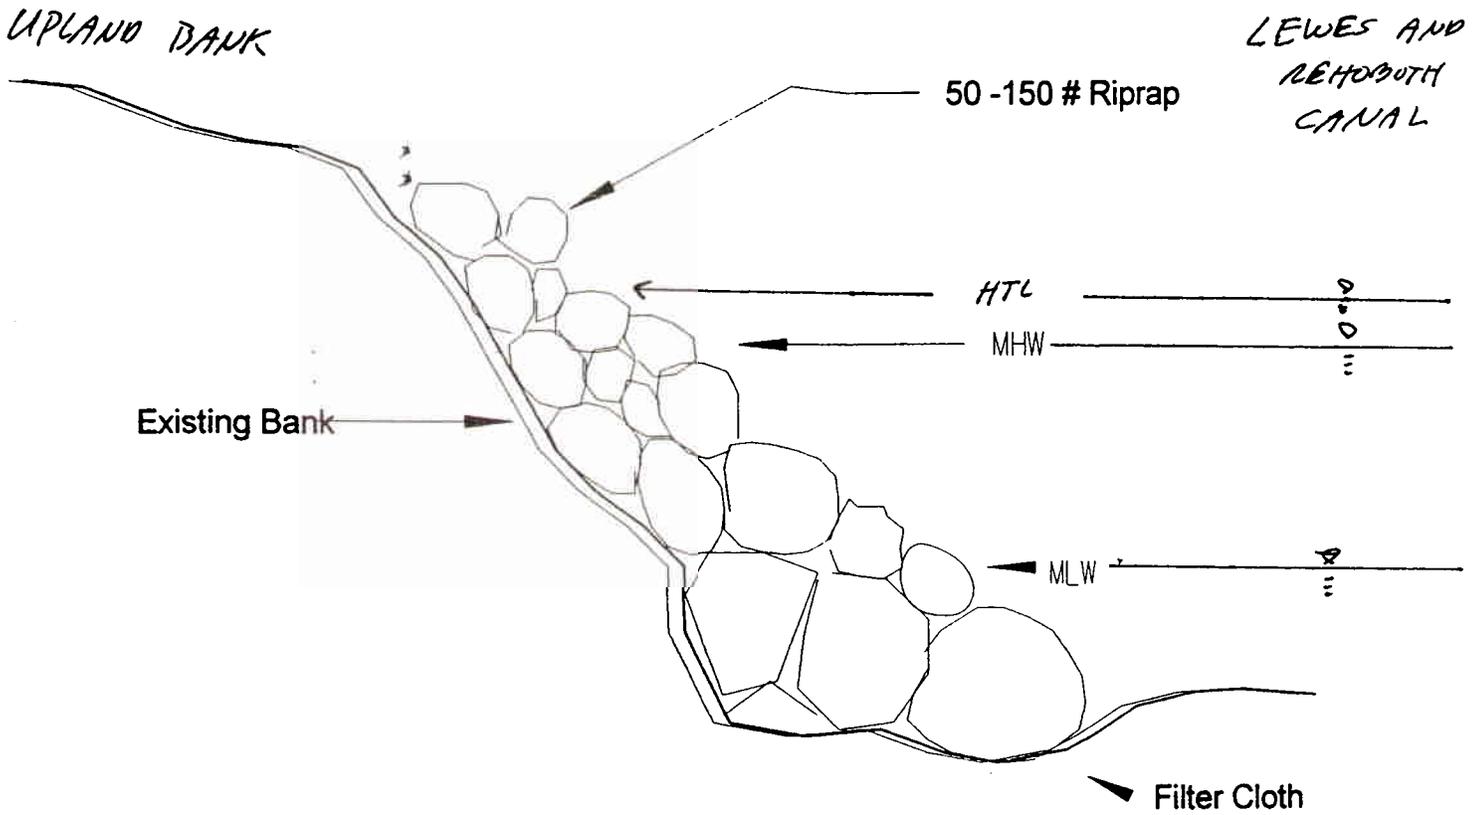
Cross-section of proposed project (prepared by Precision Marine Construction, Inc.).
